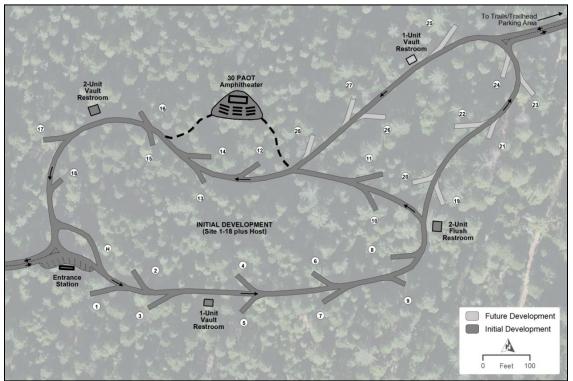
Conceptual layout for Shadow Ridge Campground.
